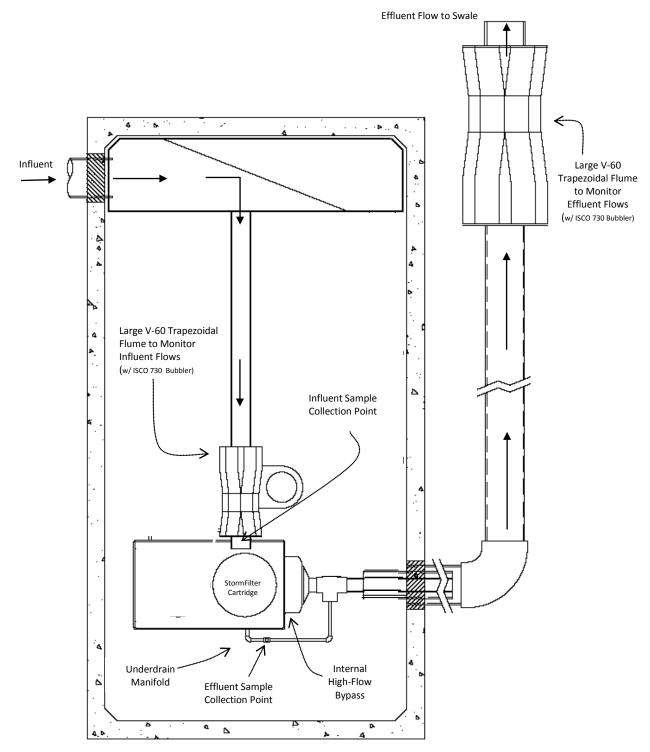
Plan view of StormFilter system at Lolo Pass Road.
